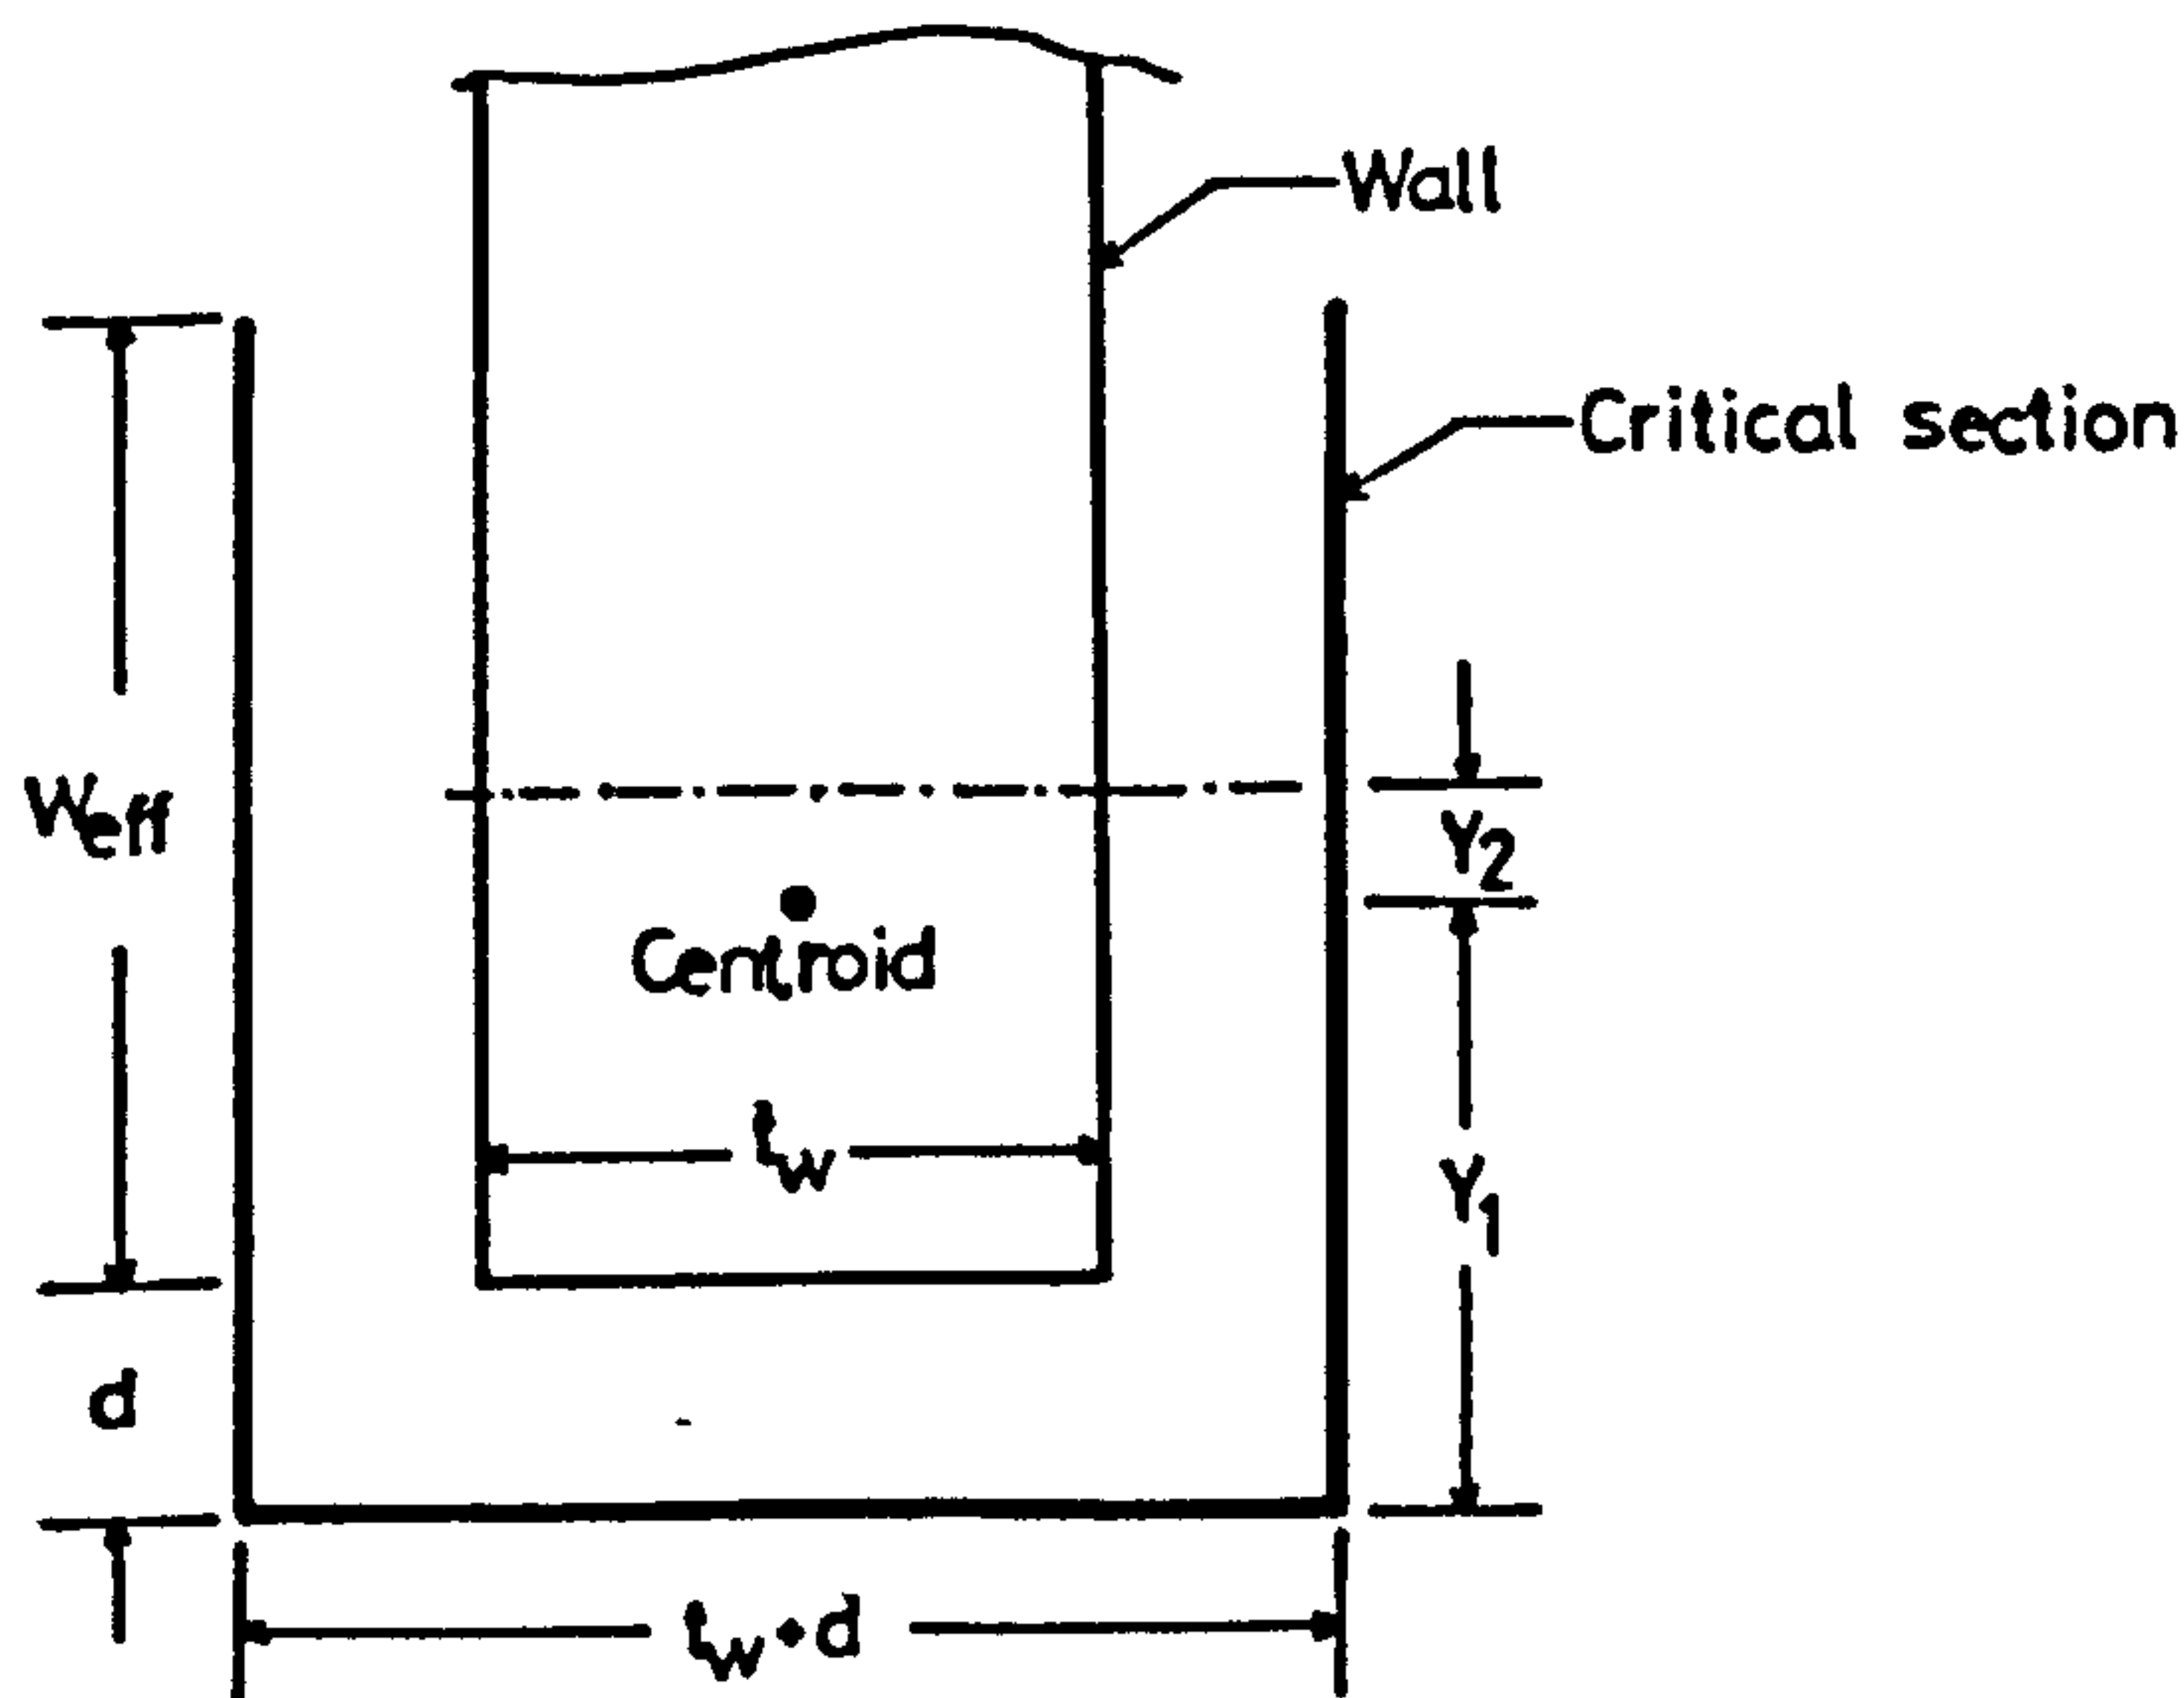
Location of proposed critical section for w. shear around the wall periphery.
